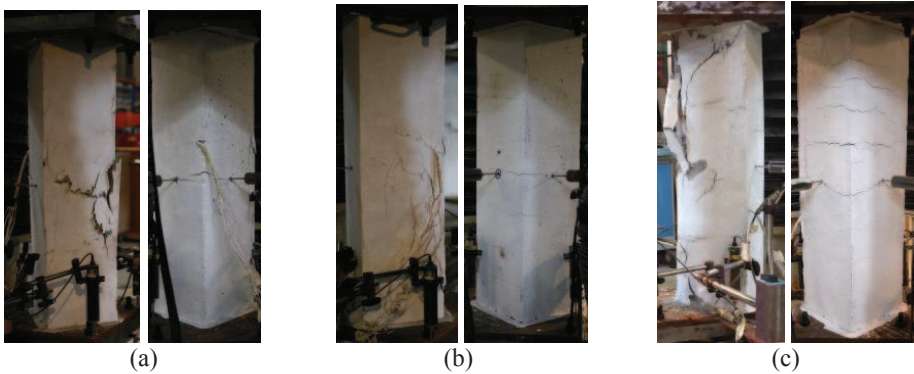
Failure mode of the test specimens: (a) Specimen 1; (b) Specimen 2; (c) Specimen 3
